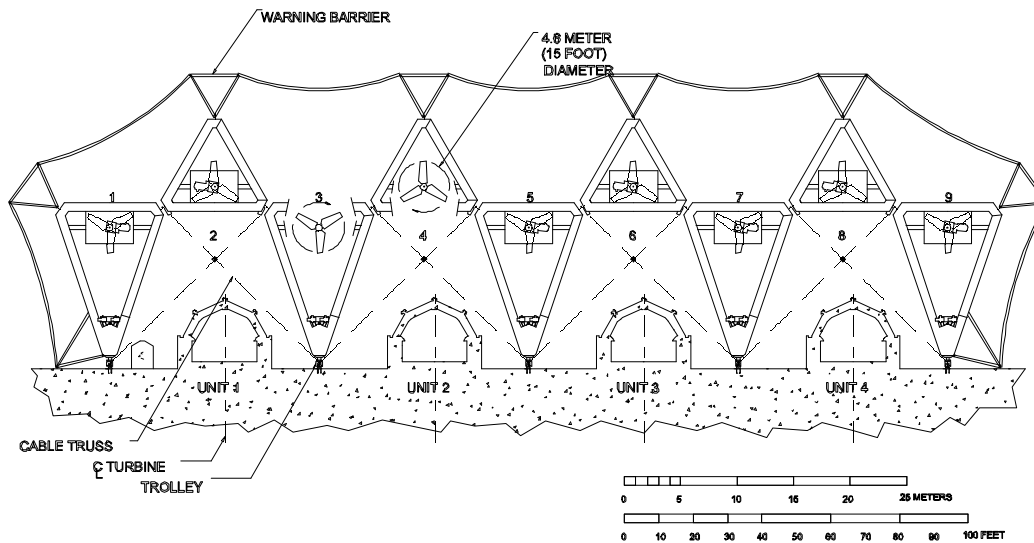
General Arrangement of Surface Water Pumps at Douglas Dam
